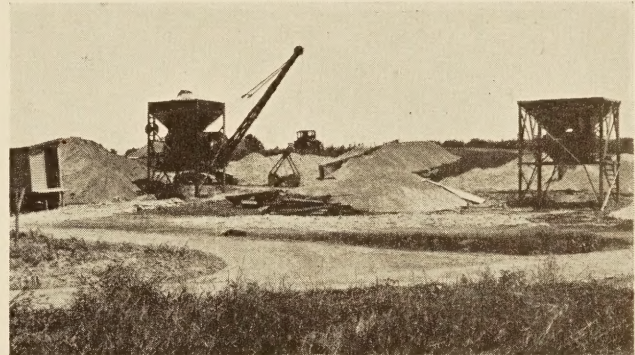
PROPORTIONING PLANT USED IN CONSTRUCTION OF TEST SECTIONS
